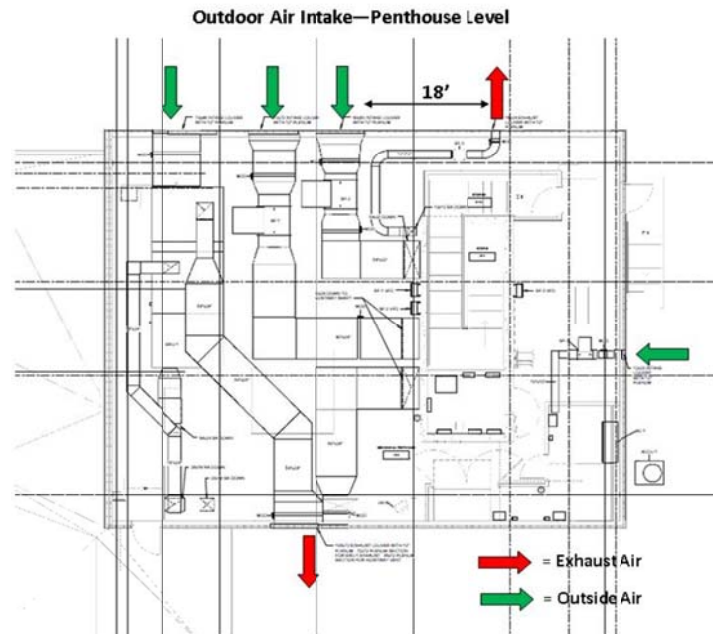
Floor plan of penthouse showing OA inlet and EA outlet locations
